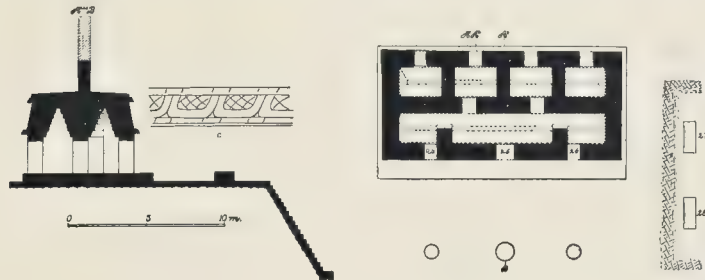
STRUCTURE 23: SECTION AND GROUND-PLAN (RESTORED).
